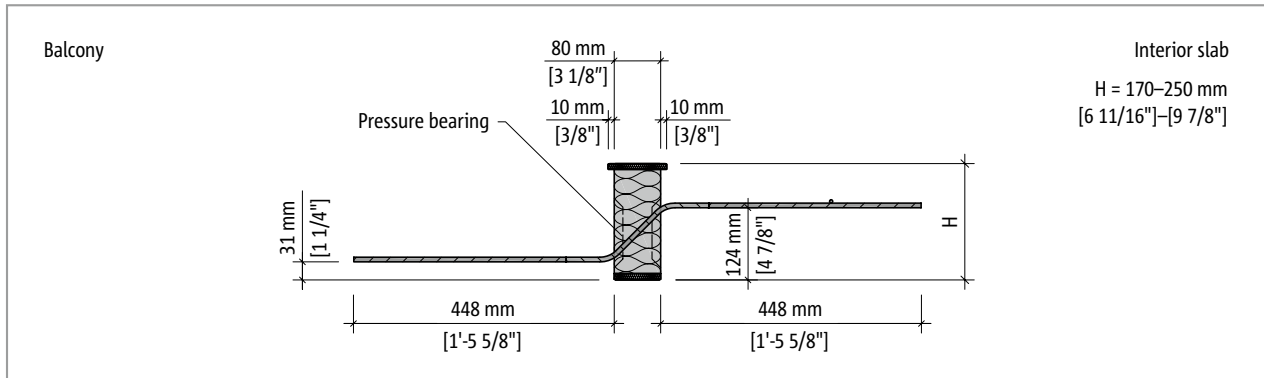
Schöck Isokorb® T Type CQ-Z-V6: Product cross-section
